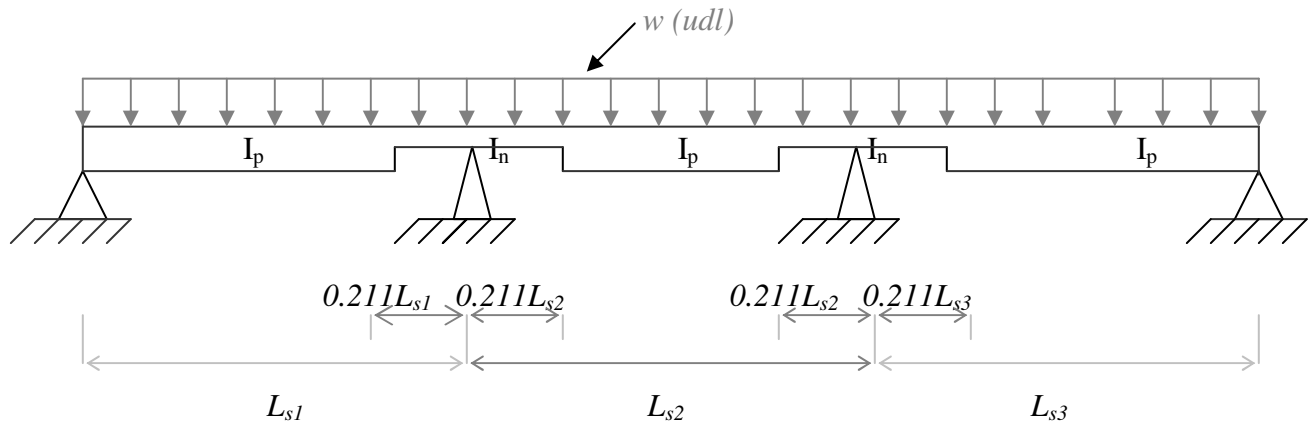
Continuous one-way composite slab loaded with uniformly distributed load
